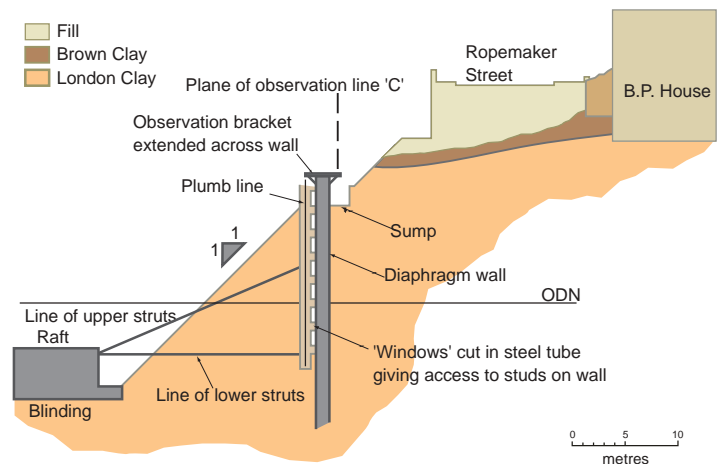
Britannic House, London: North diaphragm wall after bulk excavation and before excavation for struts
